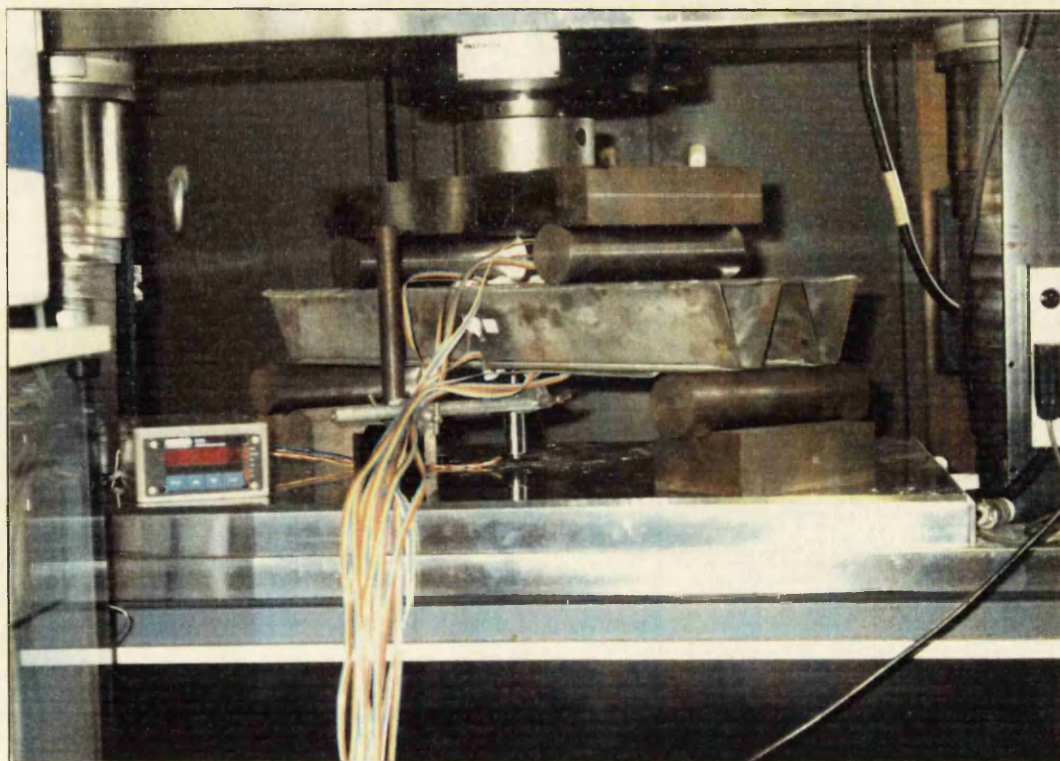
Model 0-4b at INSTRON machine before the four point bending test
